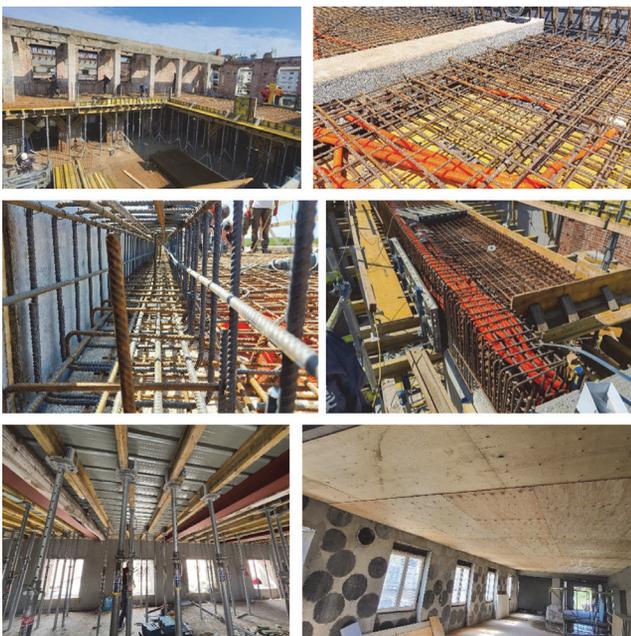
Execution of works on new and reinforcement of existing ceiling structures [3]
